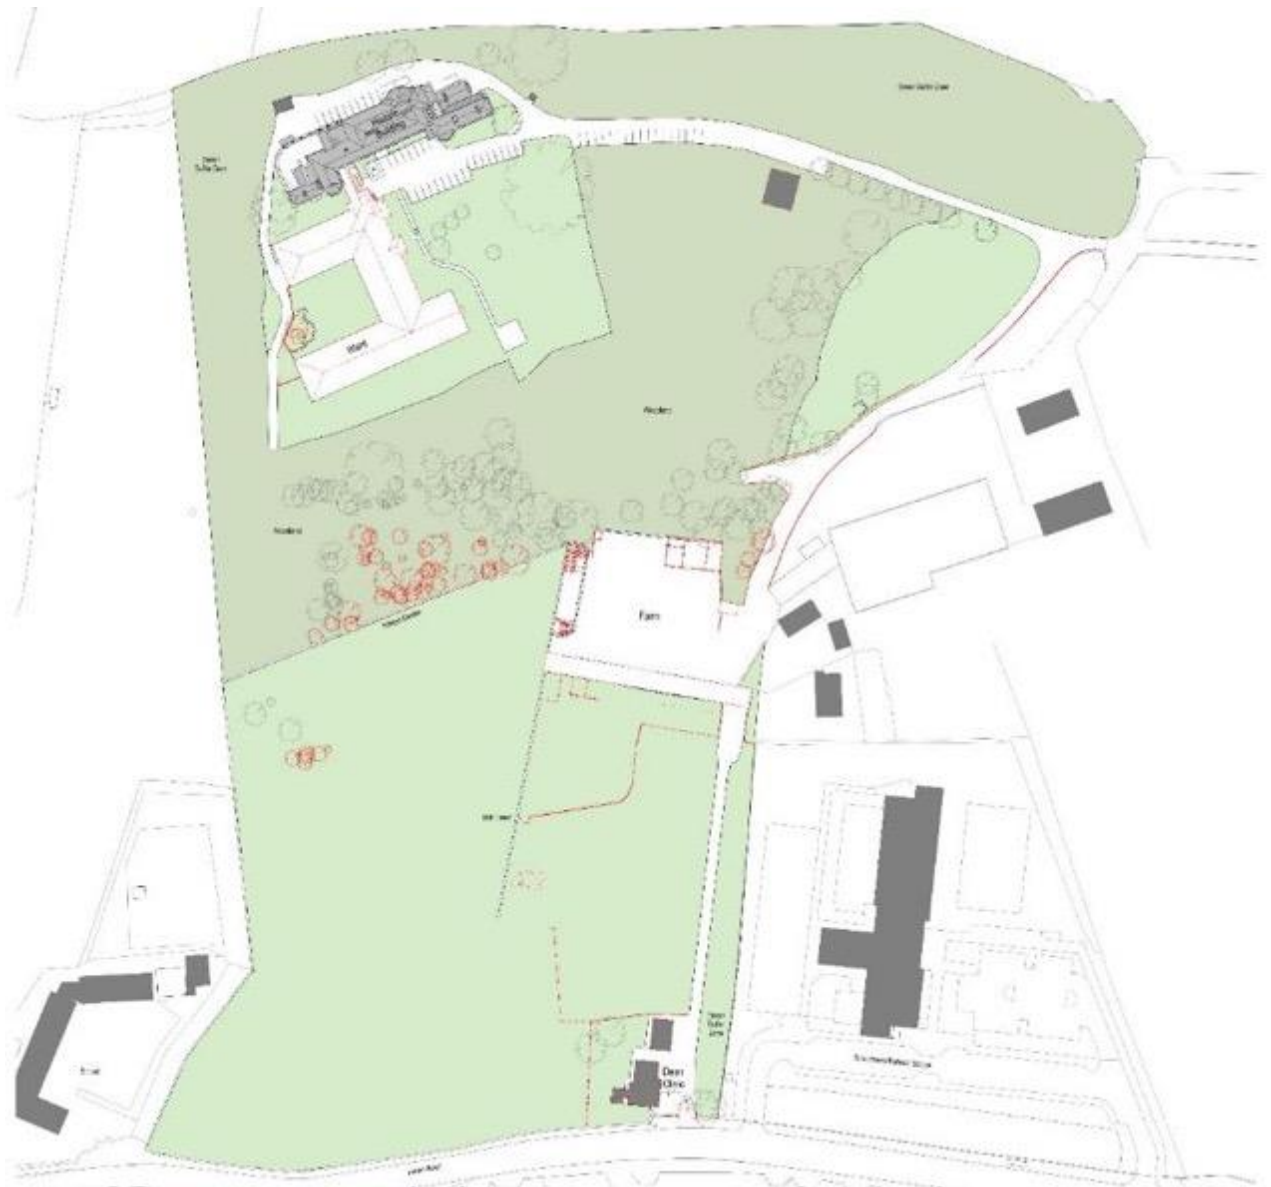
Demolition site plan. Source: TOT Architects. Elements in red are proposed for removal.
